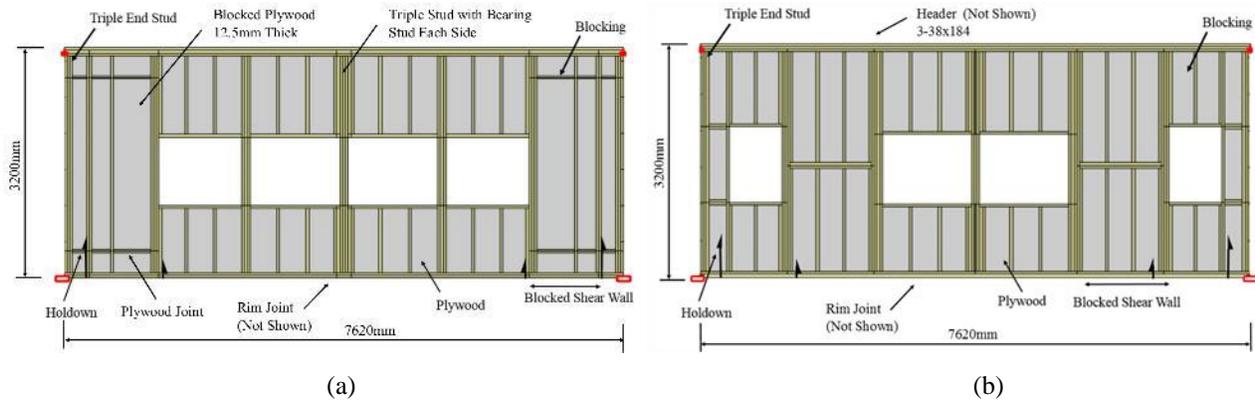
Exterior wall framing and configuration for: (a) Pattern "A", and b) Pattern "B".
